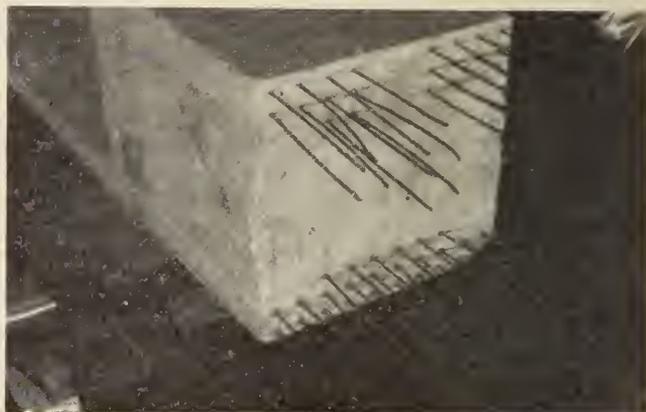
End of prestressed concrete beam showing piano wires used for prestressing.
